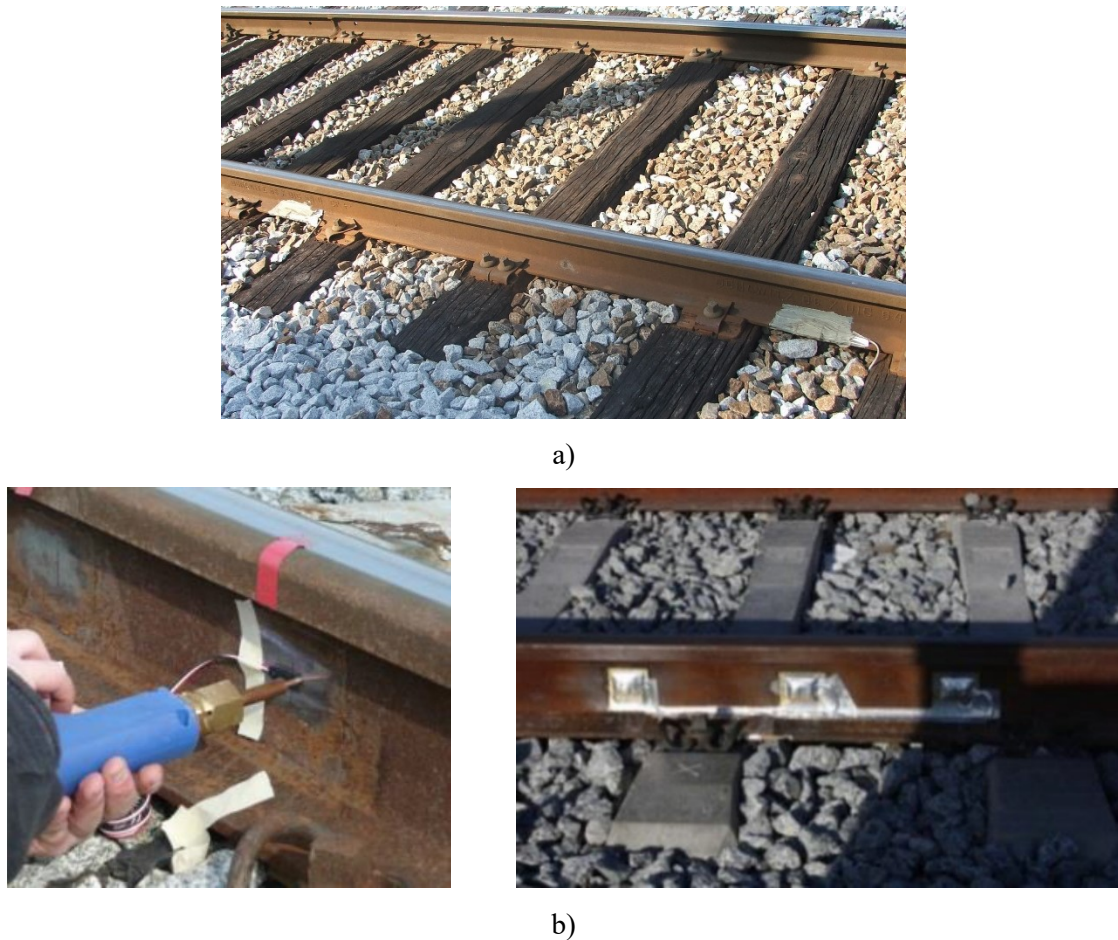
Strain gauges used in European Project “FADLESS” [7]: a) Trezói bridge; b) Alcácer do Sal bridge.
